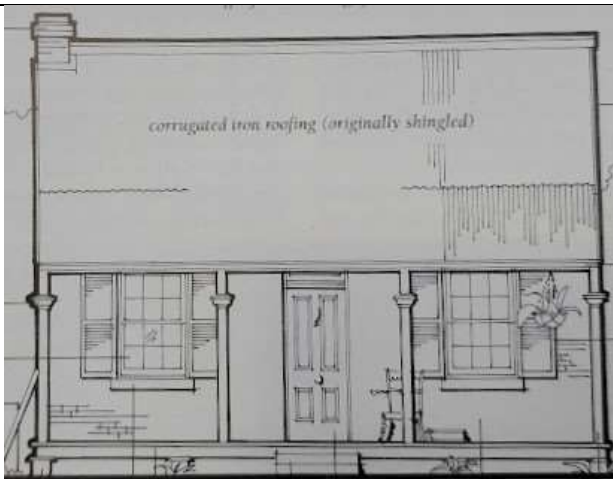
Maisey and Ian Stapleton in *Australian House Styles*, Flannel Flower Press, 1999, identify the typology of 181 St Johns Road as being Mid-century Vernacular (p. 25). As a late example dating to 1871 it has plate glass not glazing bars and turned columns – see Figure 9 below.
